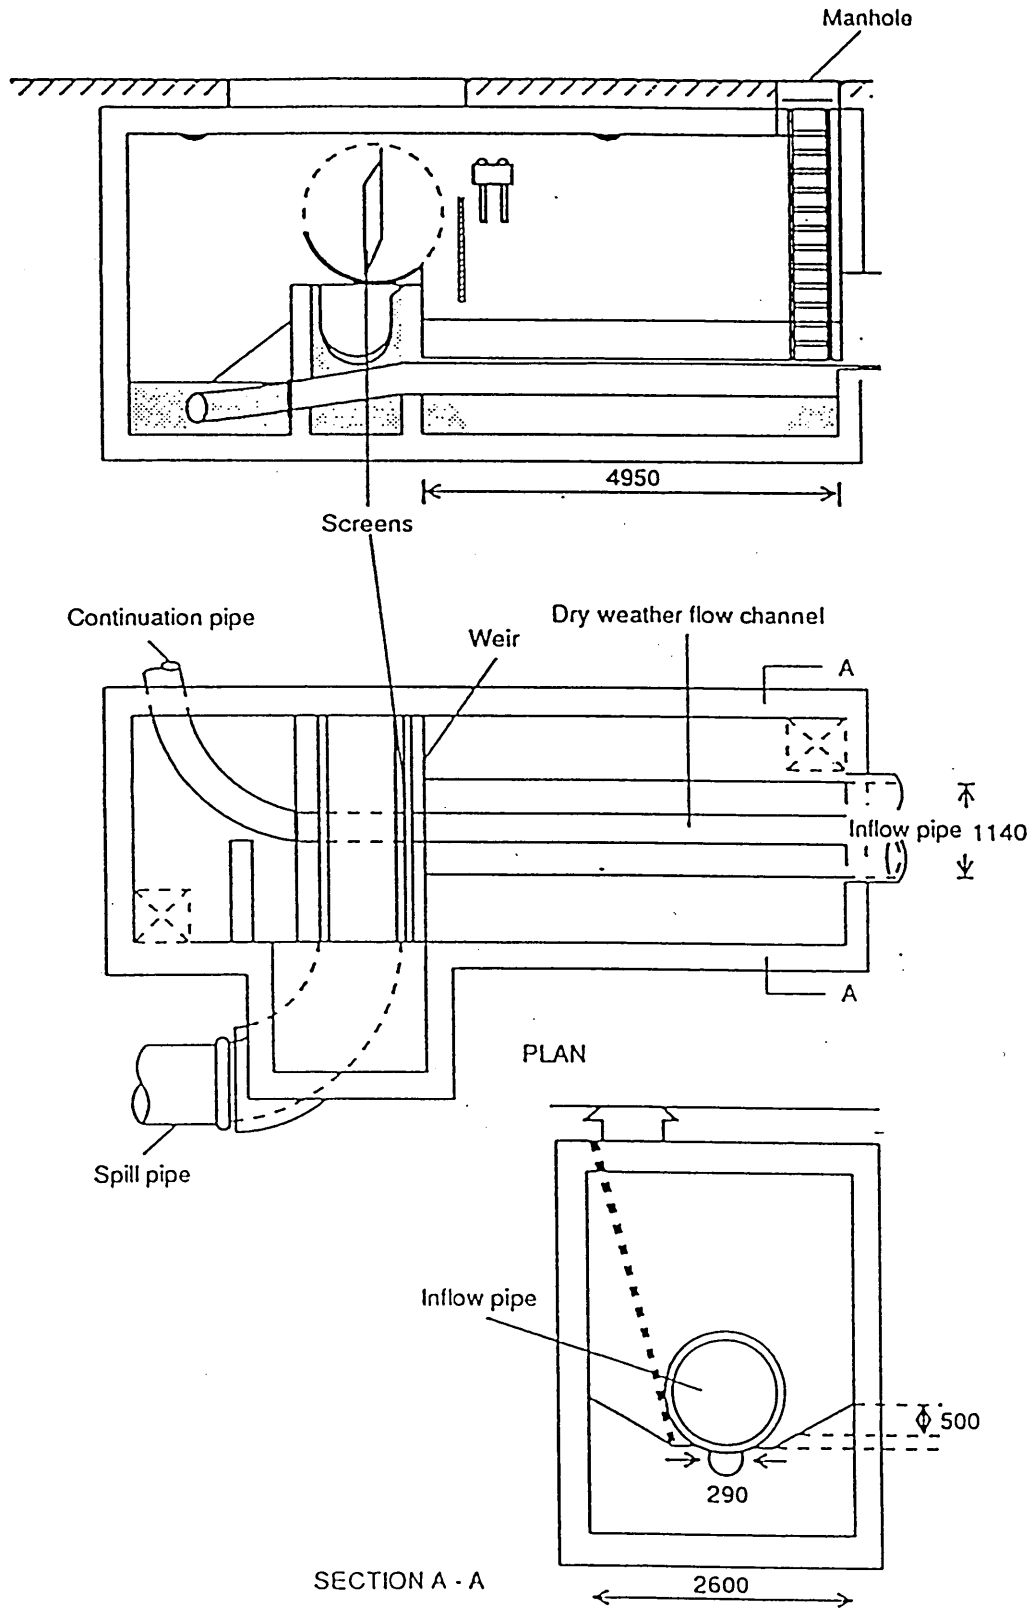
Plan and Cross-Section of the Stilling Pond Site (Chesterfield Road)
